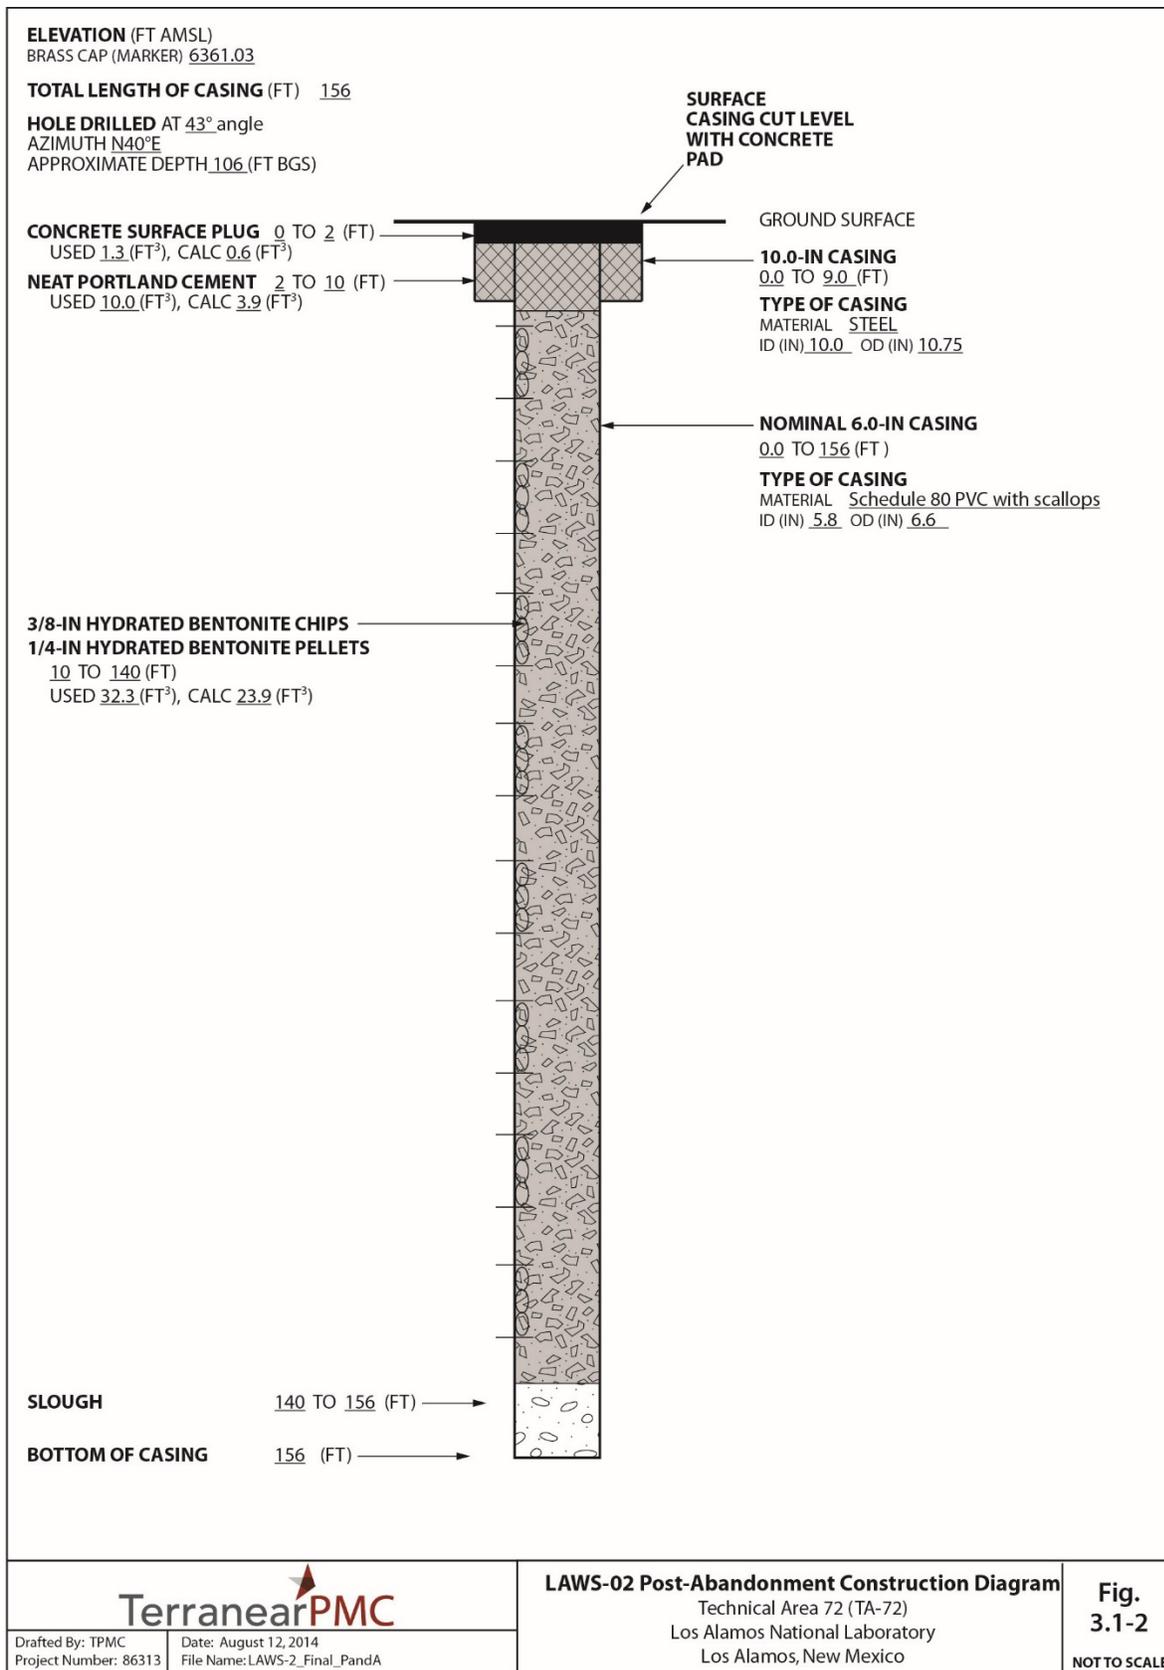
Well LAWS-02 post-abandonment construction diagram
